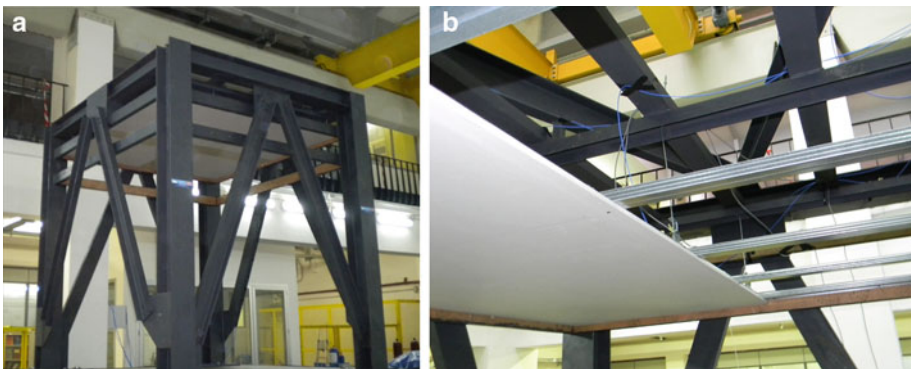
a Test frame installed on the shake table; b SFC specimen detail
